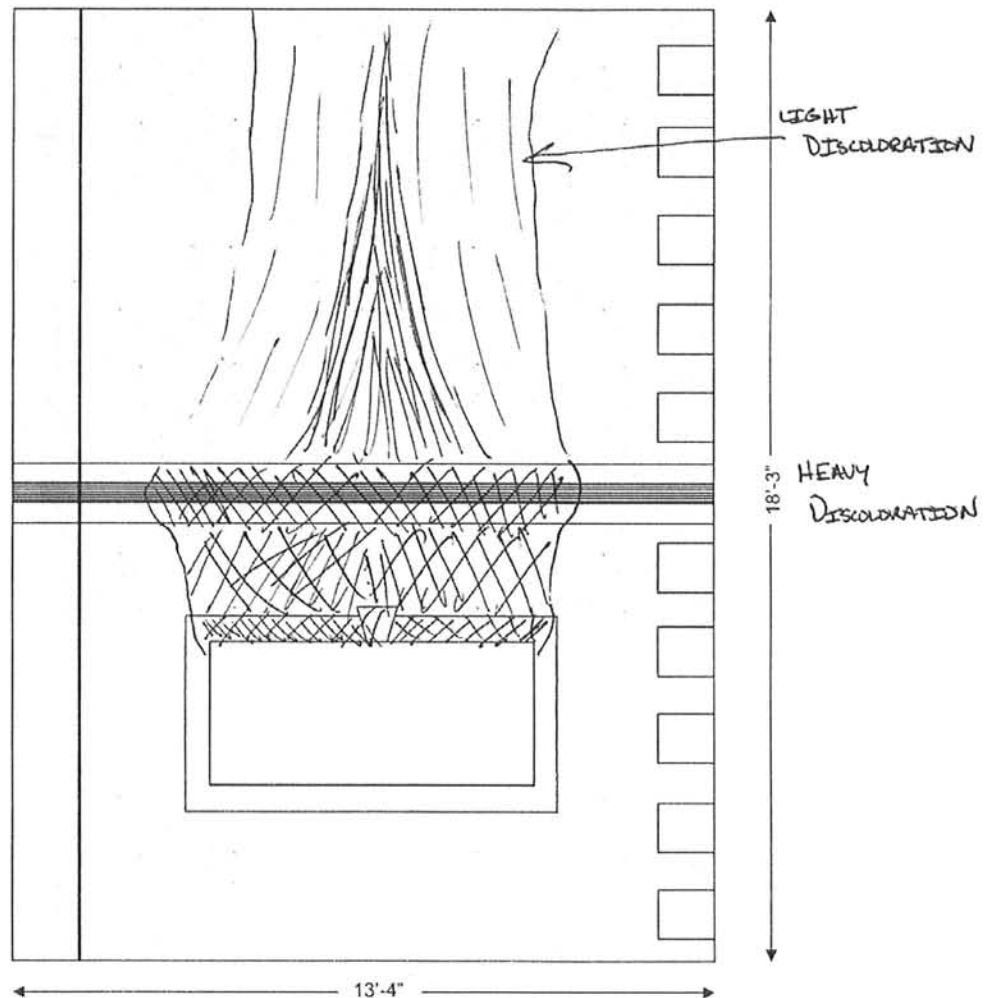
(c) Interior View of the Test Specimen. Instrumentation arrangement.
